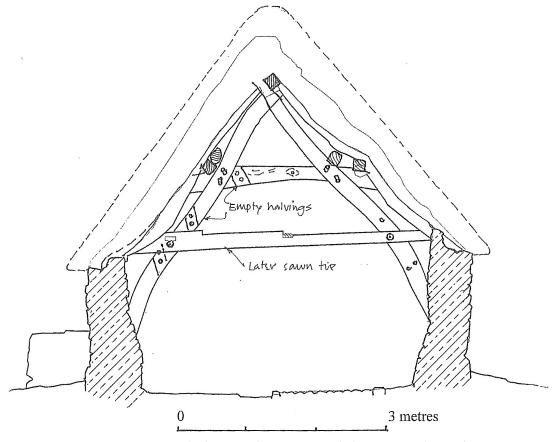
Truss No. 1. North elevation showing empty halvings — evidence of re-use.
